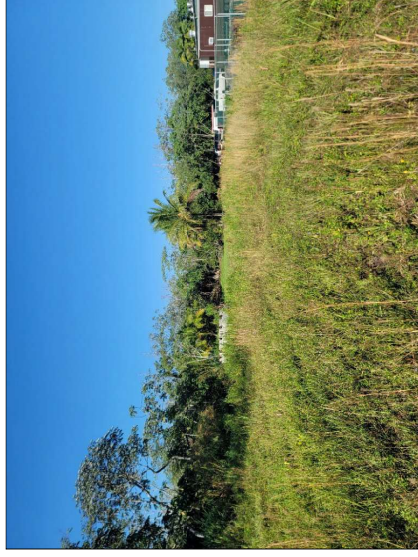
Photo overlooking the open, graded perimeter area immediately south of the plant security fence, where a Phase 1 flare and Future cogeneration facility are planned; view to west
